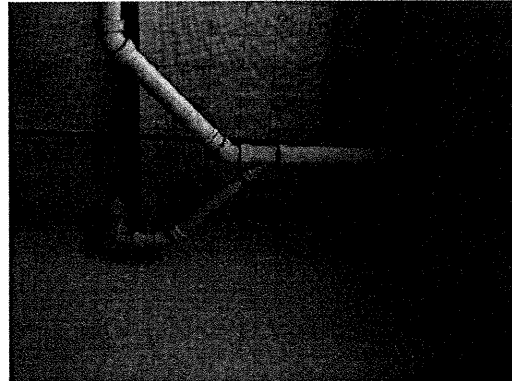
Auditorium ceiling - interior roof drain creates condensation problems, insulation recommended.
